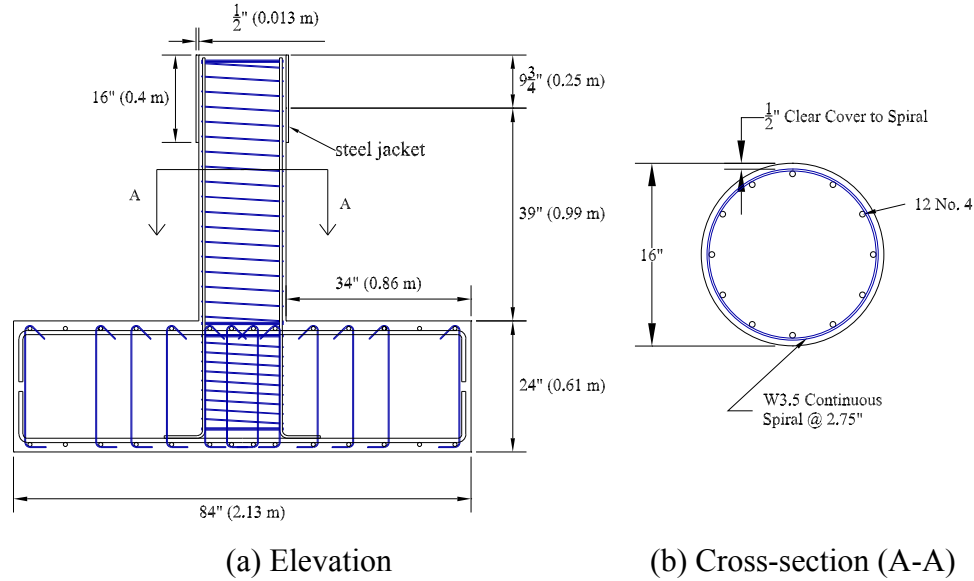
Geometry and reinforcement of the Base Column specimen
